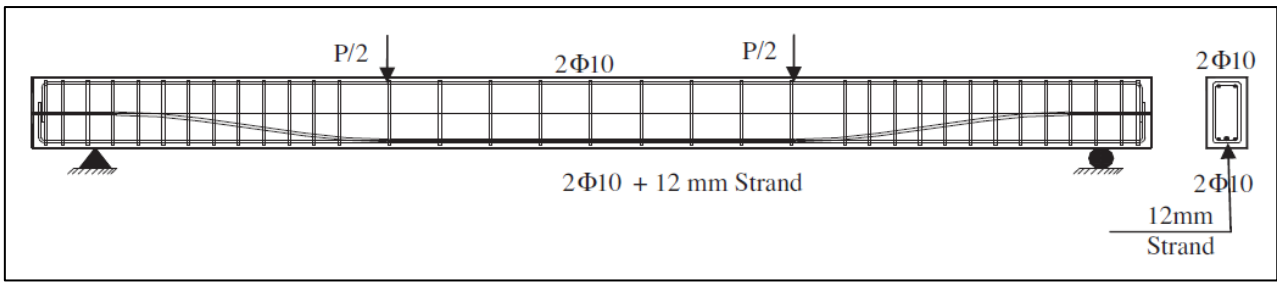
Reinforcement and dimension details of prestressed beam B2-70-P-B tested by [6]
